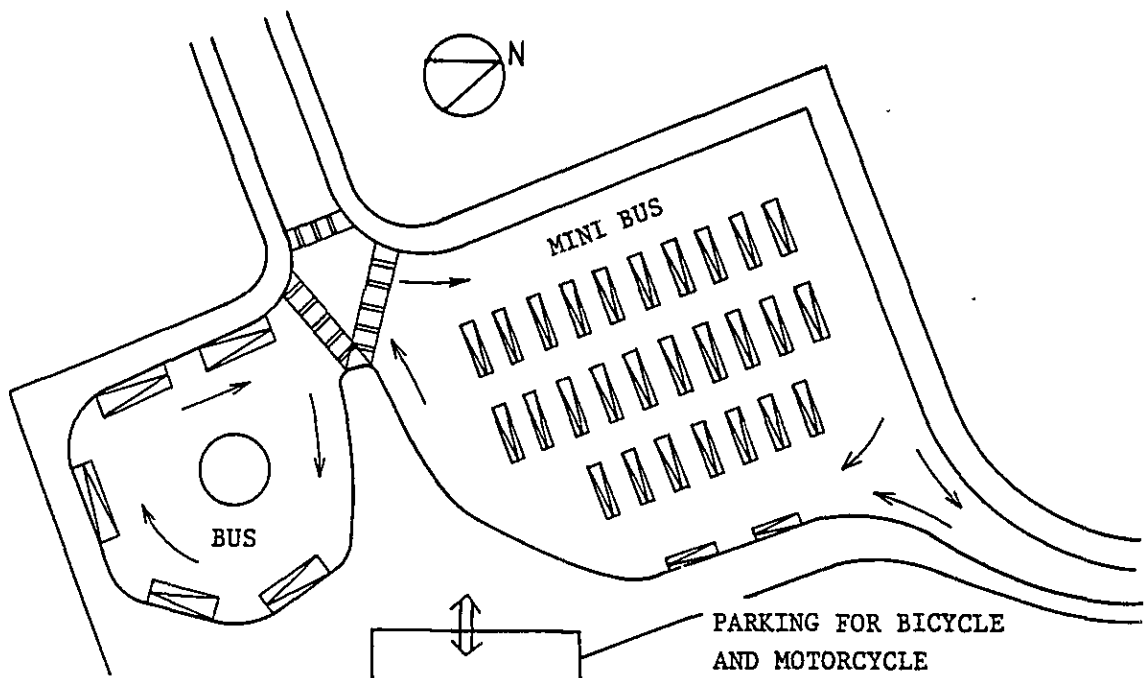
Layout of Station Front Plaza at PALMERA Station S = 1:1000
